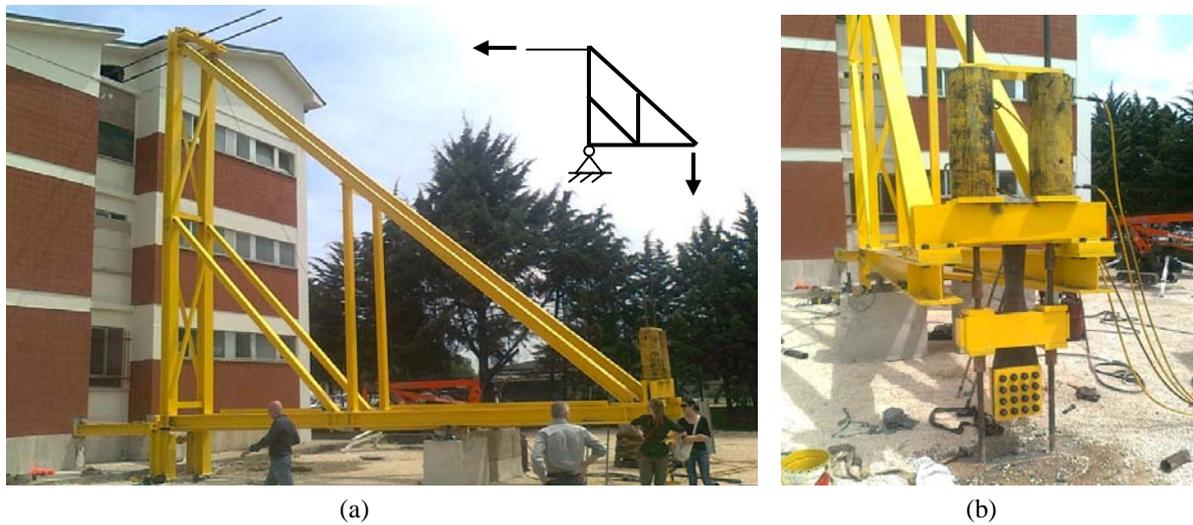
Loading system: (a) triangular steel truss; (b) hydraulic jacks and dovetail shaped steel plate.
